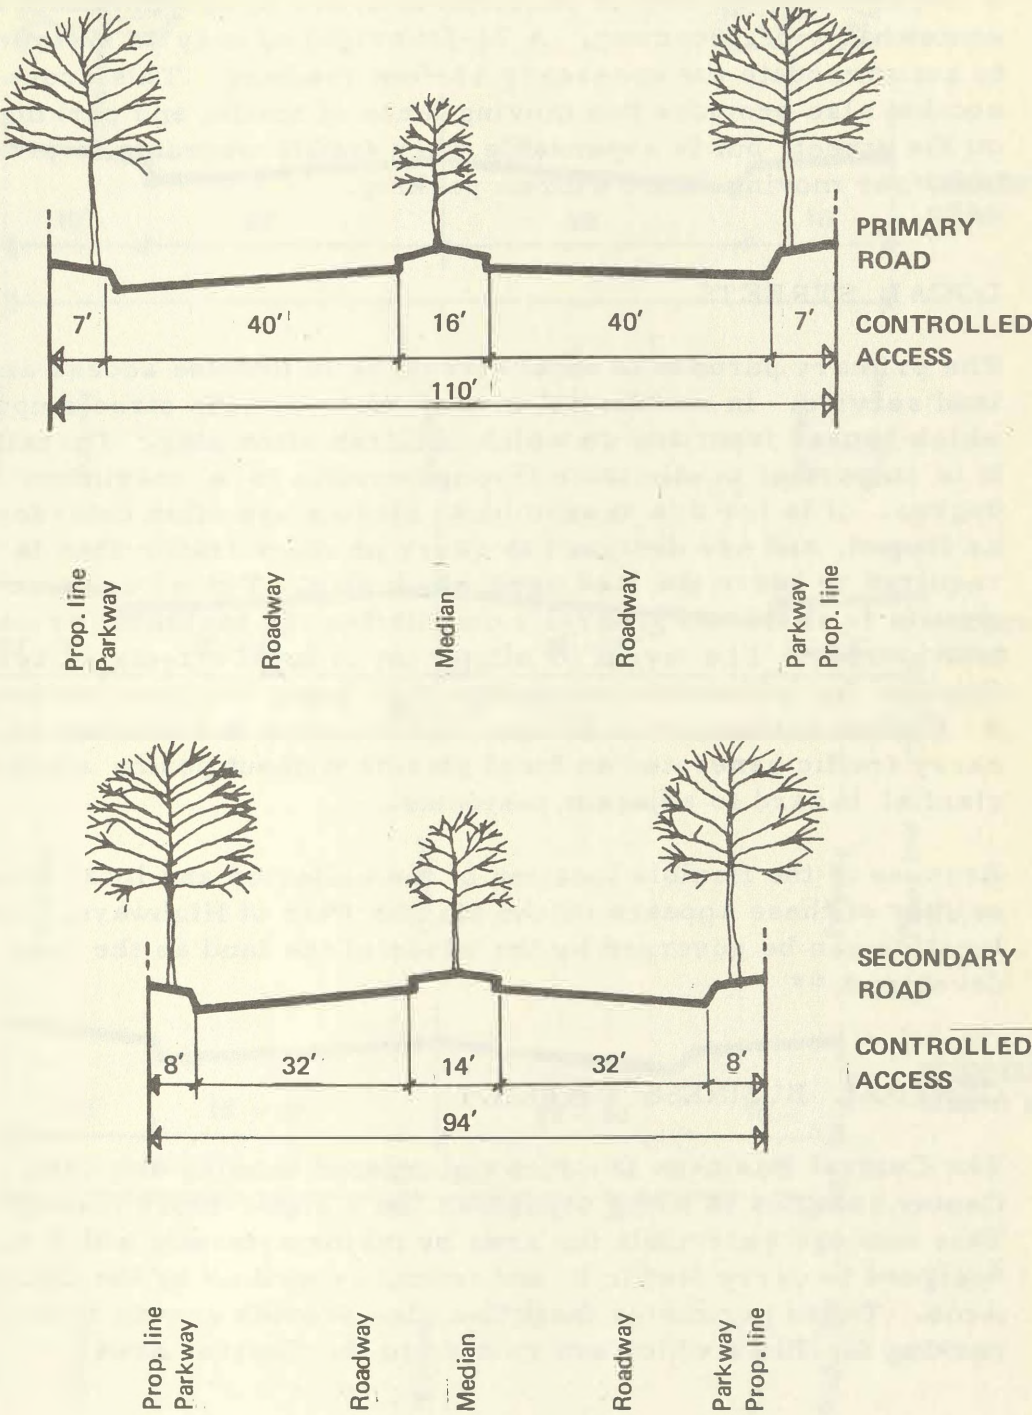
PRIMARY & SECONDARY ROAD CROSS SECTION
